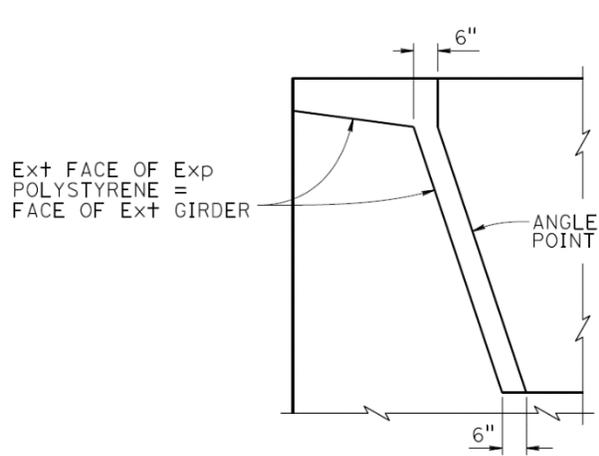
Deck Joints at Vertical Exterior Girders (Over 20° Skew)
